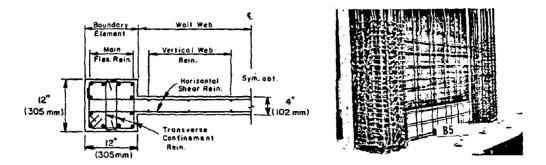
Dimensions and reinforcement arrangement of Corley, Fiorato, Oesterle and Scanlon's walls [2.12].
